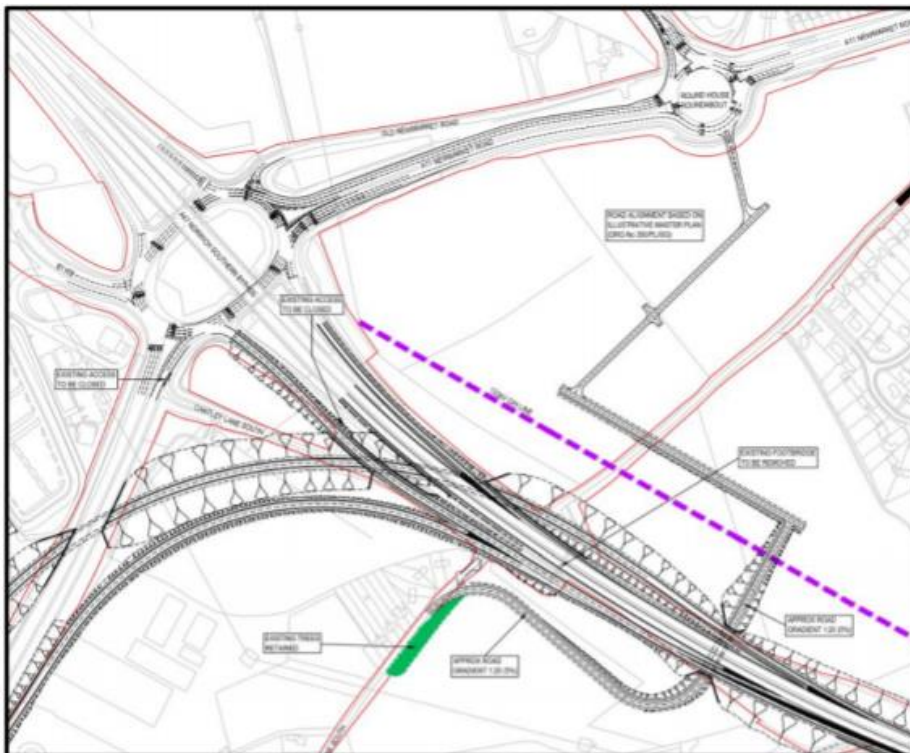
Option 3: Connection of Cantley Lane South to Round House Roundabout via an A47 underbridge
